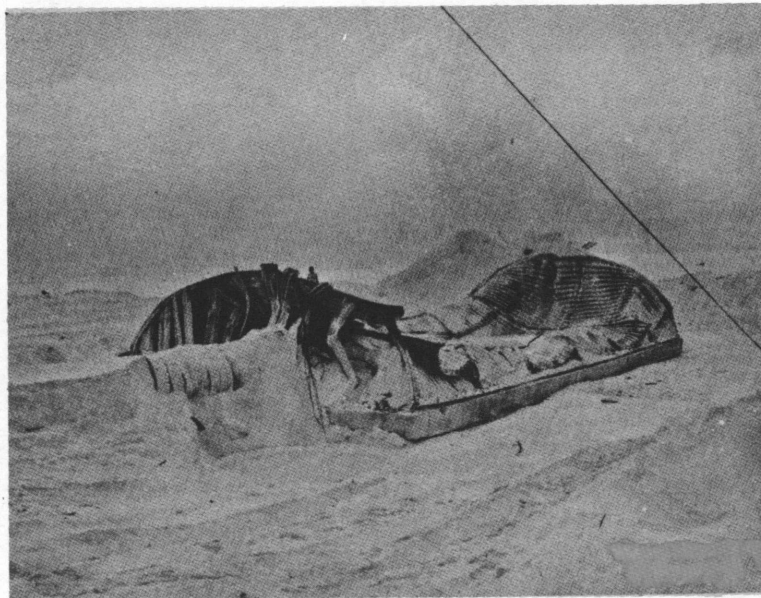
Structure 3.2c, damaged end walls; GZ to left.
